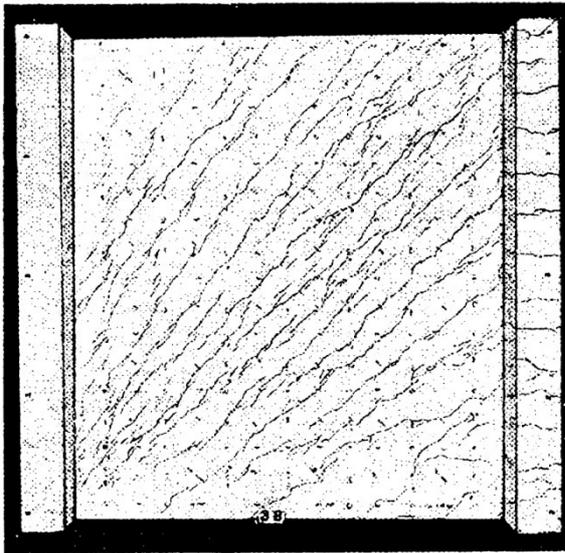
Cracking pattern for wall S3 tested by Maier and Thürlimann (1985) at first yielding of horizontal web reinforcement
